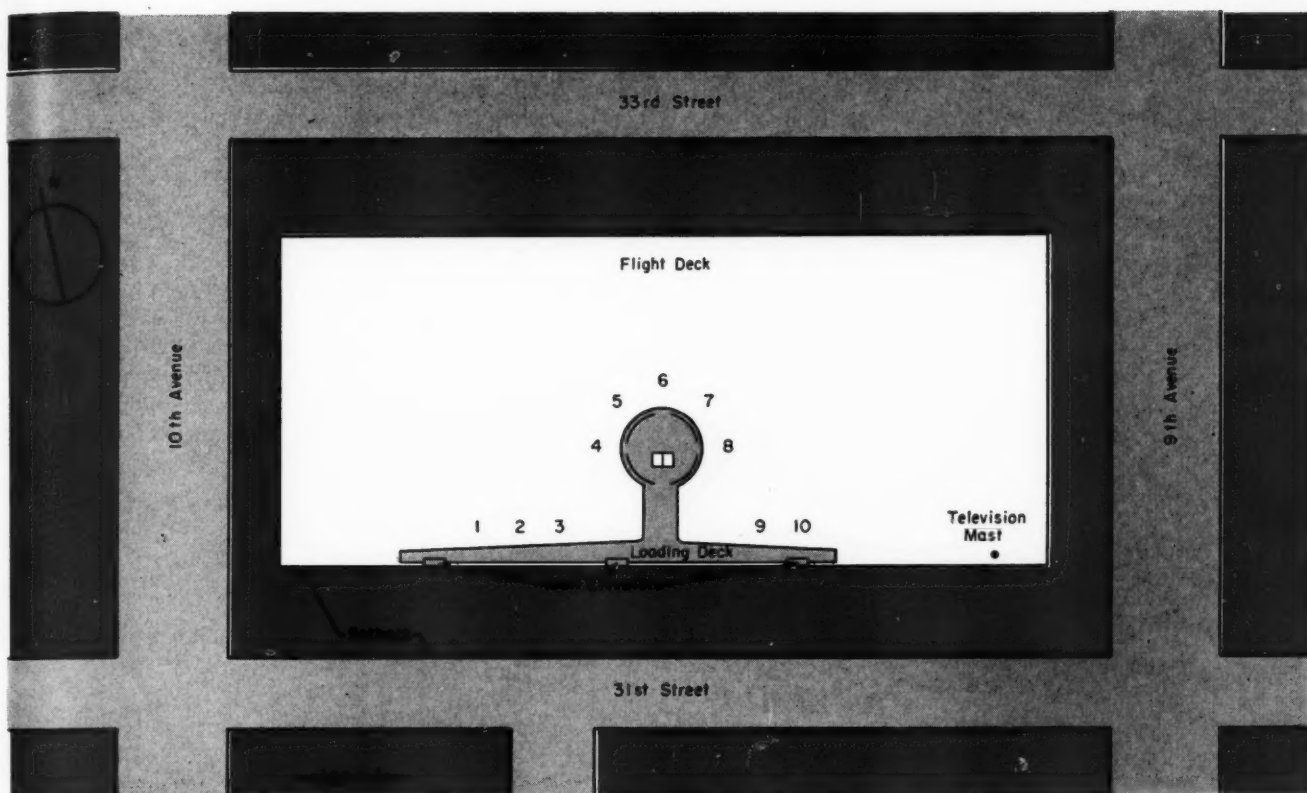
ANOTHER NEW YORK BUILDING, BEING PLANNED FOR WEBB & KNAPP, HAS TENTATIVE LAYOUT FOR ROOFTOP HELIPORT 20 STORIES ABOVE GROUND. HELIPORT WILL PRIMARILY SERVE POST OFFICE IN BUILDING.
